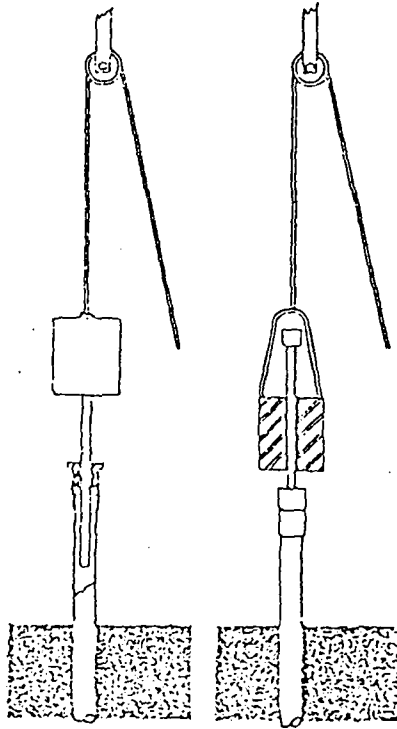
DRIVE-BLOCK ASSEMBLIES FOR DRIVING WELL POINTS.
